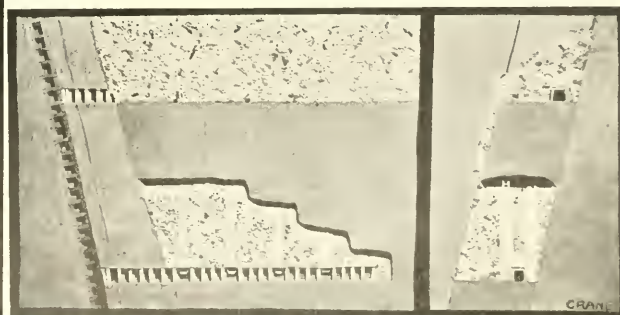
DRAWING PILLARS UNDER FILLED STOPES
